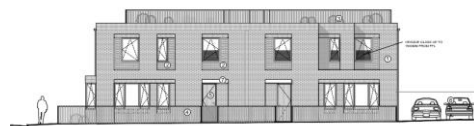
Internal East Flank Façade Mews Entrance Consented via 19/2087/VRC
